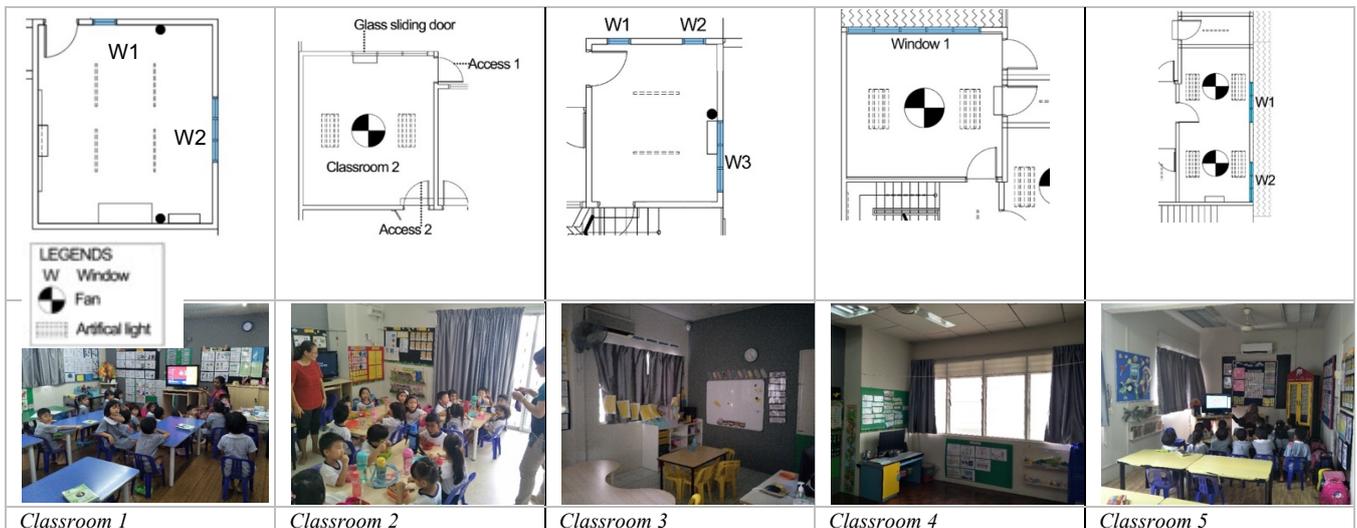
Location of windows or glass sliding door for Classroom 1,2,3,4 and 5.
